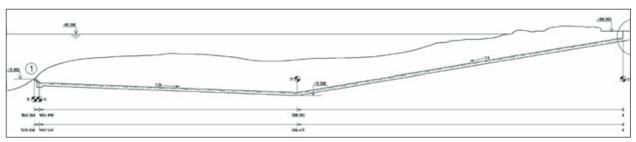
Longitudinal section of the Intake Tunnel with spoil trap and low point. (Illustration: Multiconsult /Statoil)
